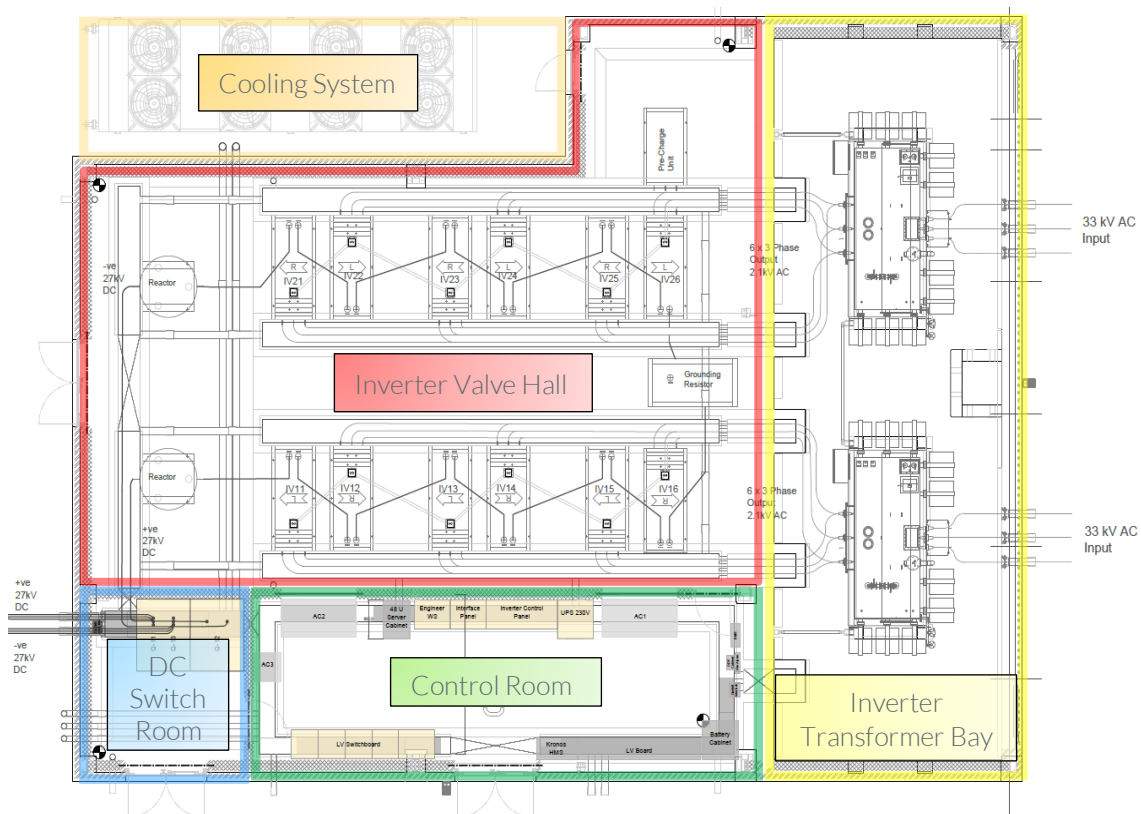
Physical layout of the plant items within each MVDC converter building.
